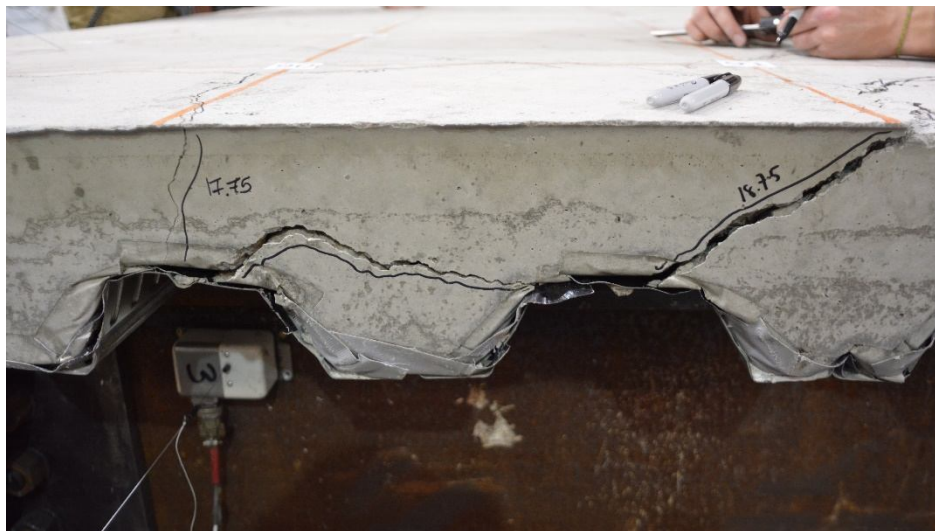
Evidence of Rib Shear Failure on Perimeter Fasteners of Fixed Beam
